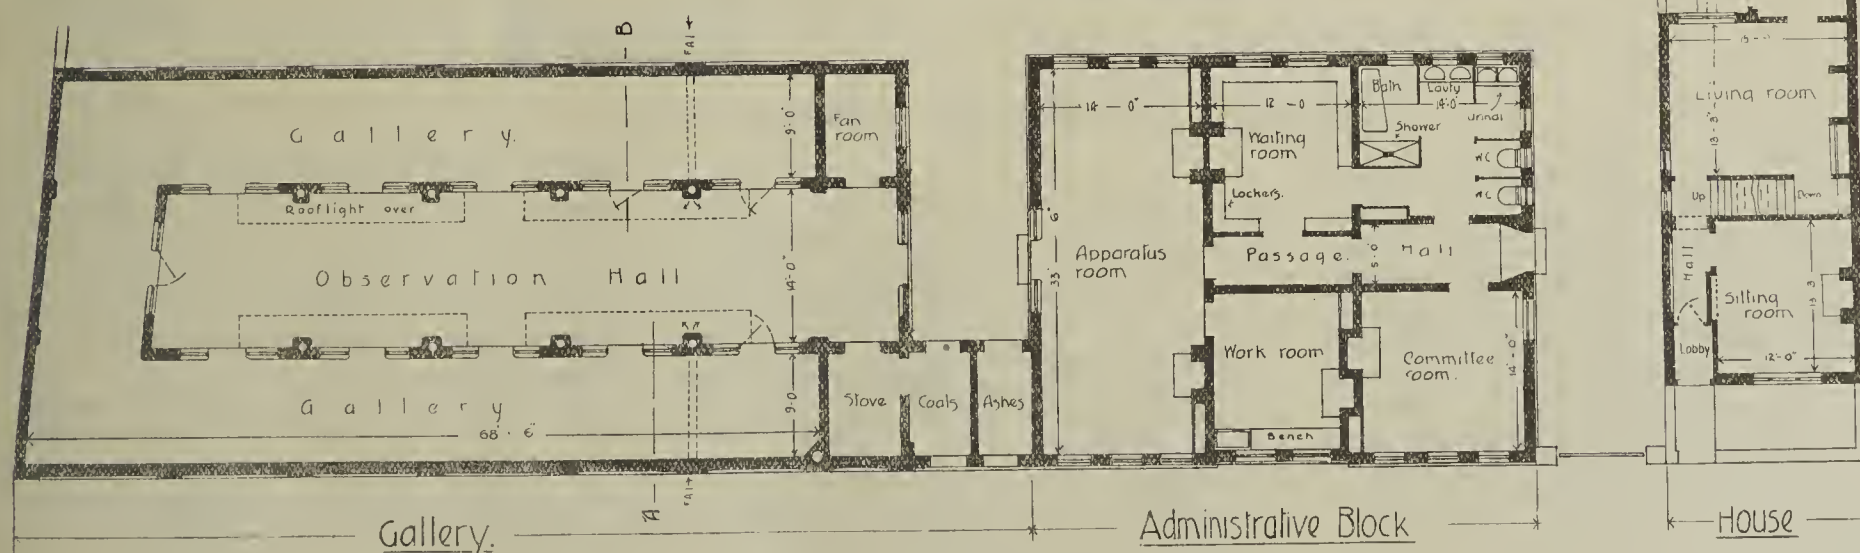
PLAN AND SECTIONS OF NEW RESCUE STATION AT BARNSELY.
